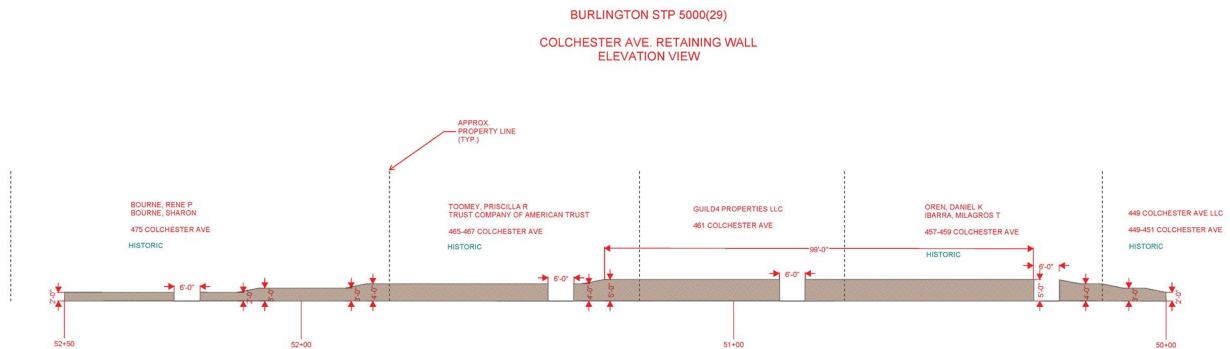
A visual representation of the retaining wall with heights and opening widths. Graphic by HNTB.
